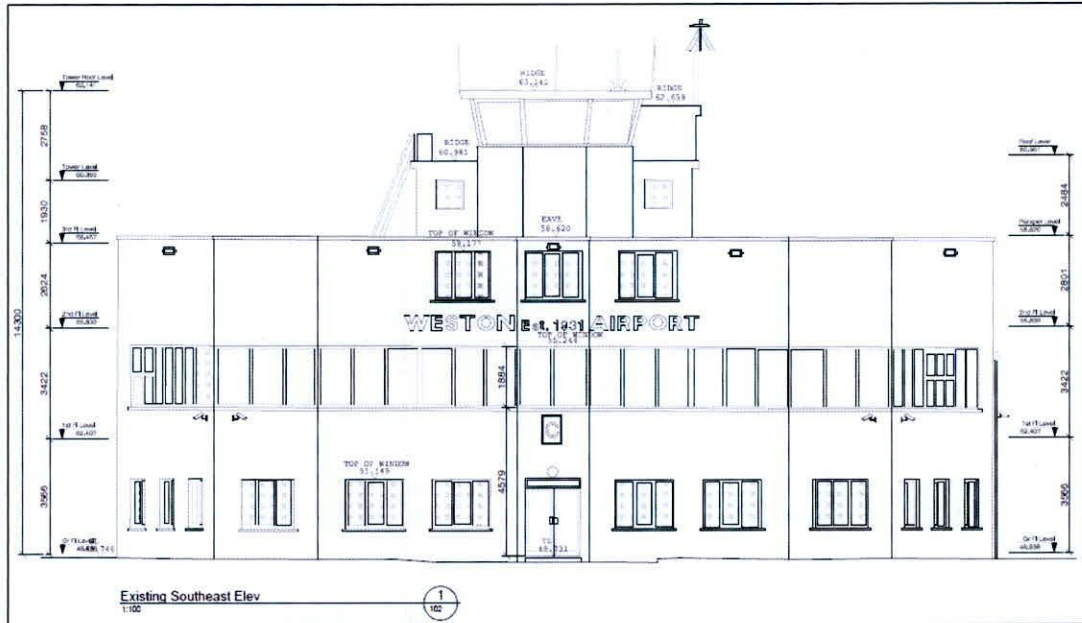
Drawing 937-102 Existing Southeast Elevation (Source: NBK)
